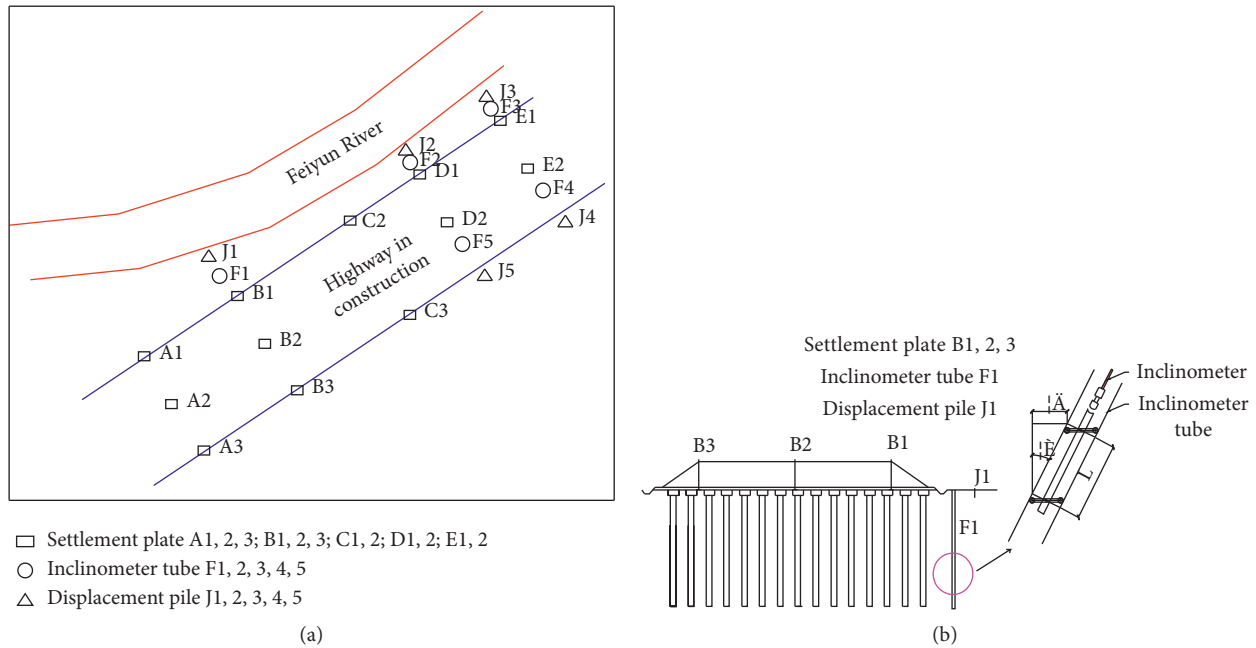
Site layout and instrumentation for field test: (a) plan view of the embankment monitoring facilities, (b) diagram of typical section monitoring facilities.
